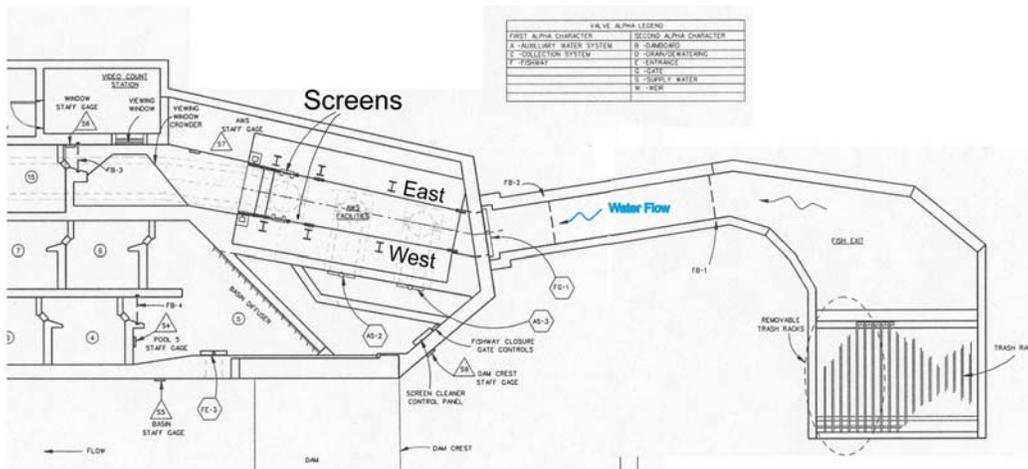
Plan View of Part of Nursery Bridge Fishway and Screens
